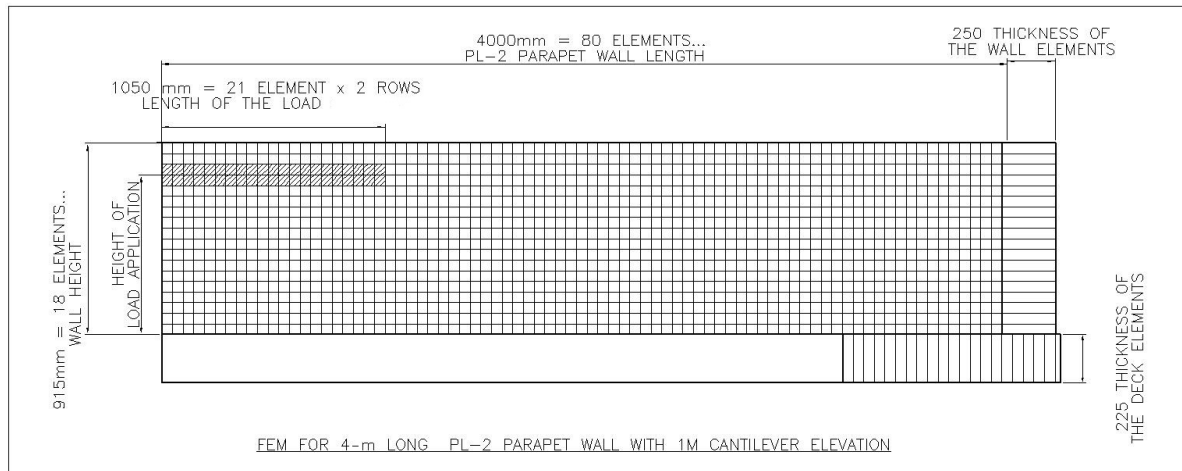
Elevation and Section of PL-2 Parapet FE Model
